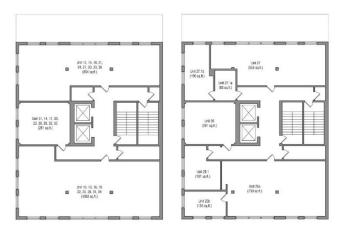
, 245 (left to right, top down): Building 8, ninth floor (1926); same floor (1981). 1" = 32'. North is to the left.
